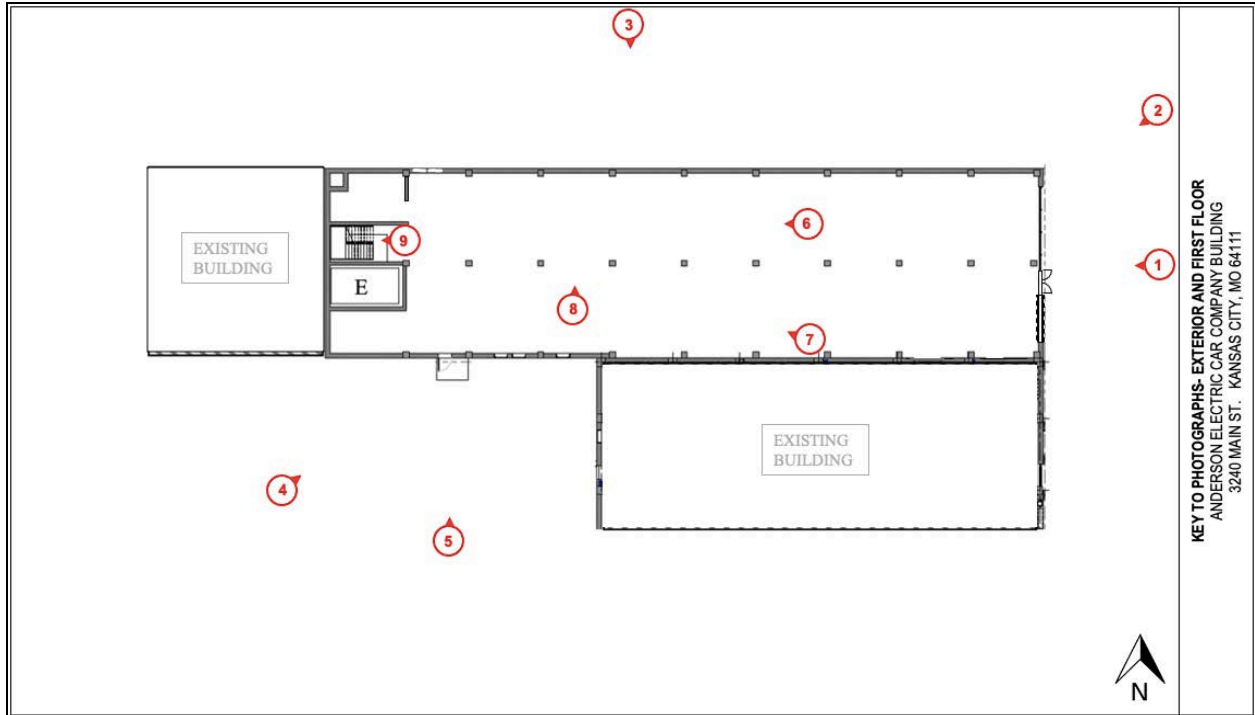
Key to photographs and current floor plan, exterior and first floor.
